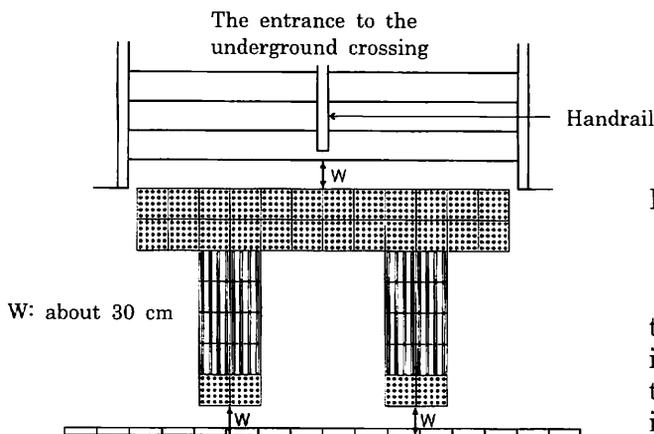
Example of installation (3) at the exit and entrance of the underground crossing (The situation where the direction of the entrance to underground passage is at right angles to the direction of travel of the footway and a handrail is installed in the center of the stairway)
